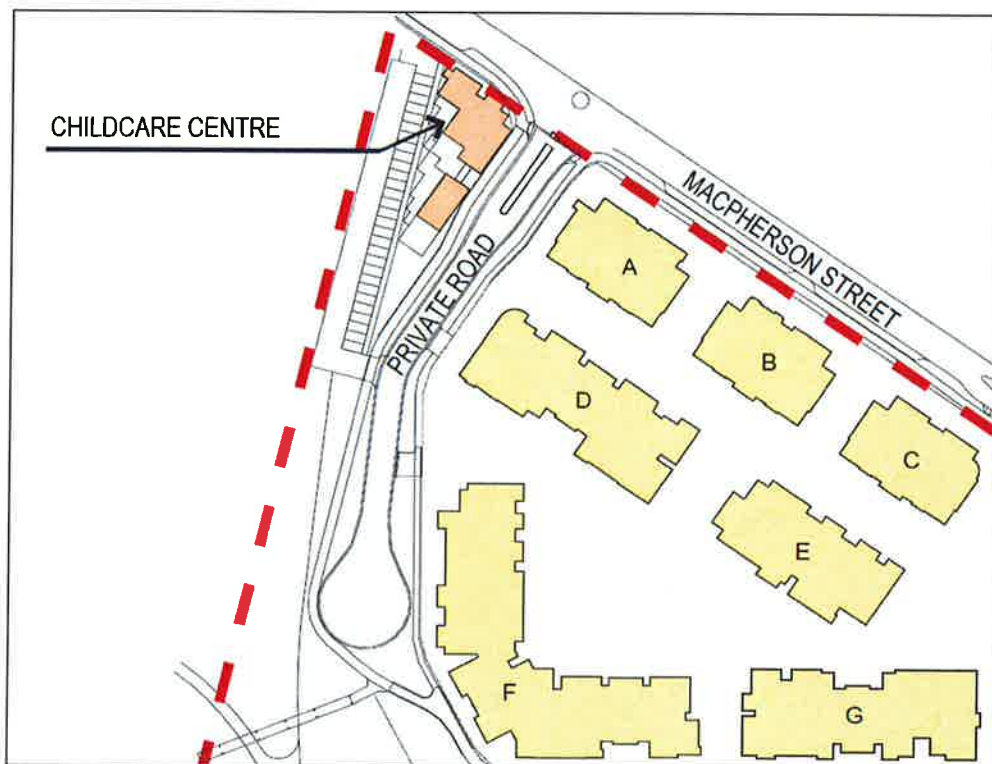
Proposed Concept Plan land use plan illustrating the enlarged childcare centre location
